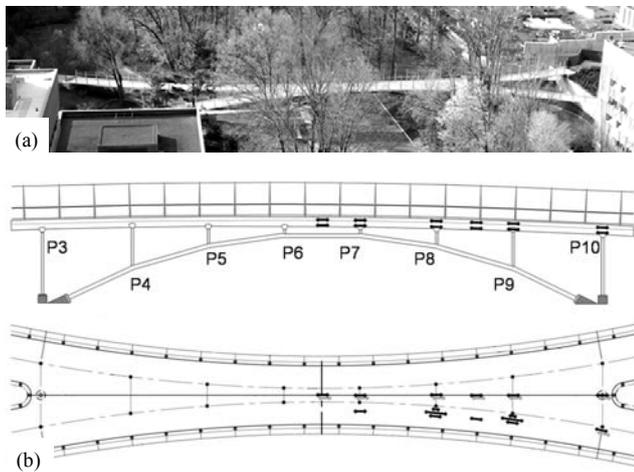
Aerial photo of Streicker Bridge (a) and its structural scheme (b), from [1]. Streicker Bridge is made of a concrete prestressed slab, supported by steel hollow columns and a steel arch.
